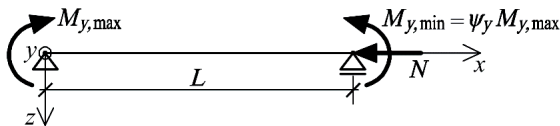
Loading pattern of considered beam-column of HEB 300 cross-section
